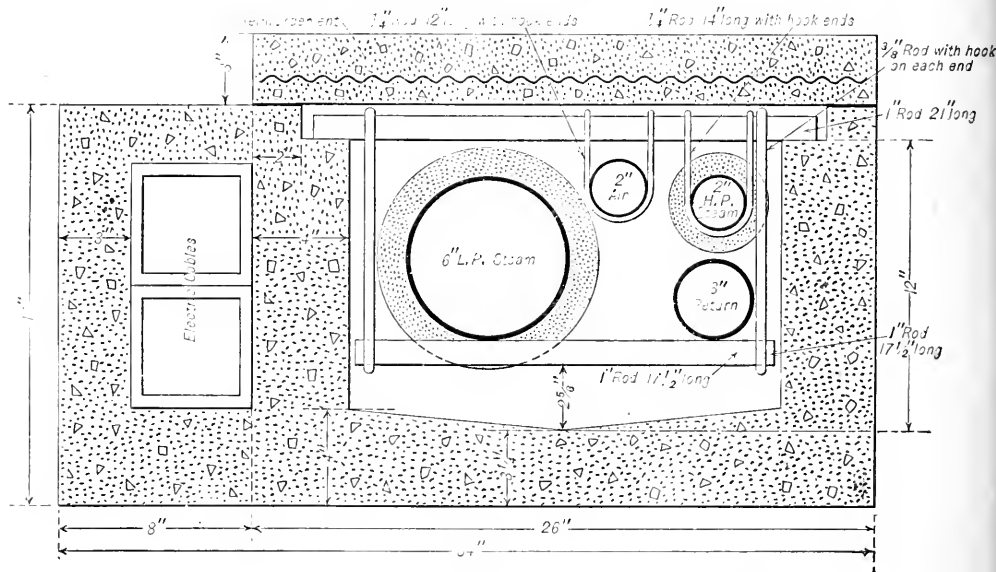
RECTANGULAR CONDUIT FOR USE UNDER ROADWAYS.
